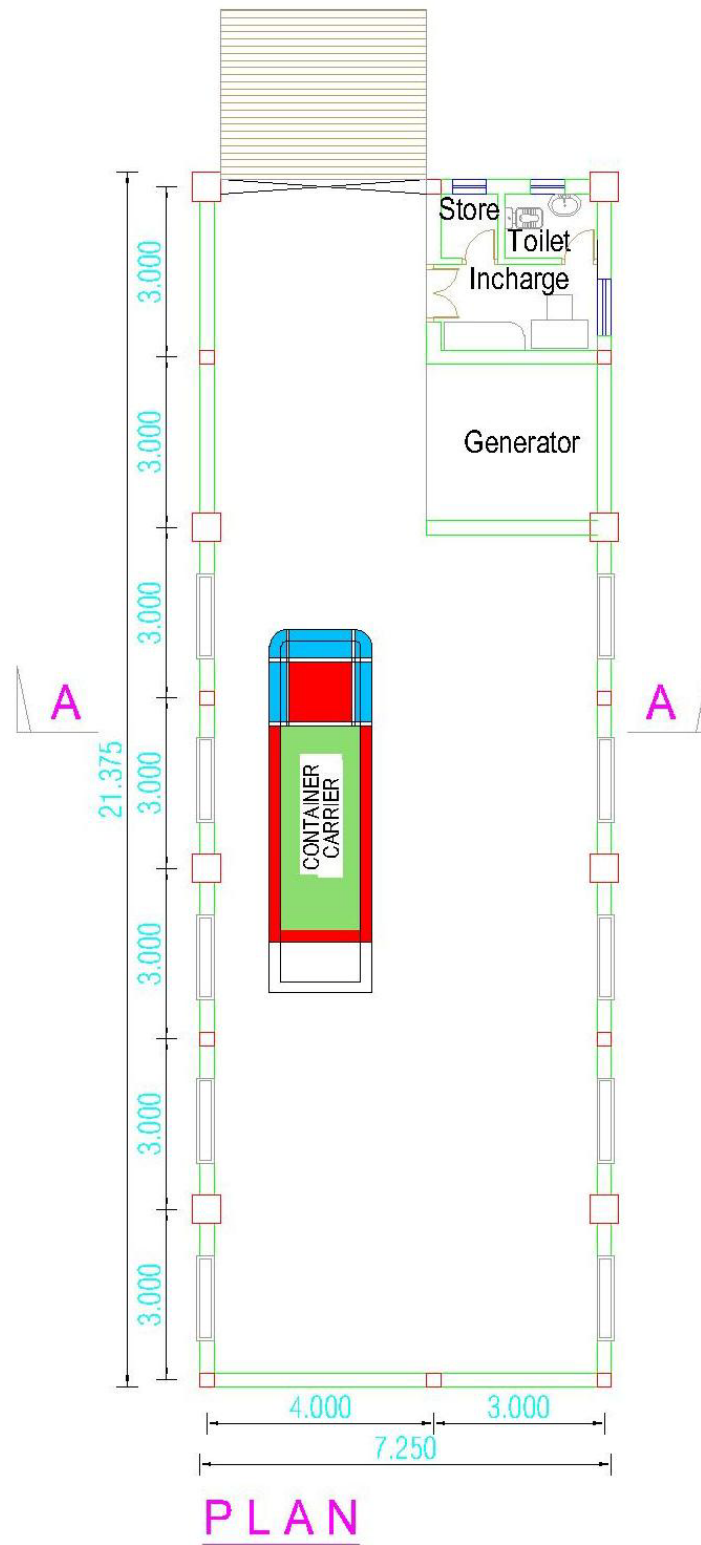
STS – 10 Mohazonghata Road Preliminary Plan
